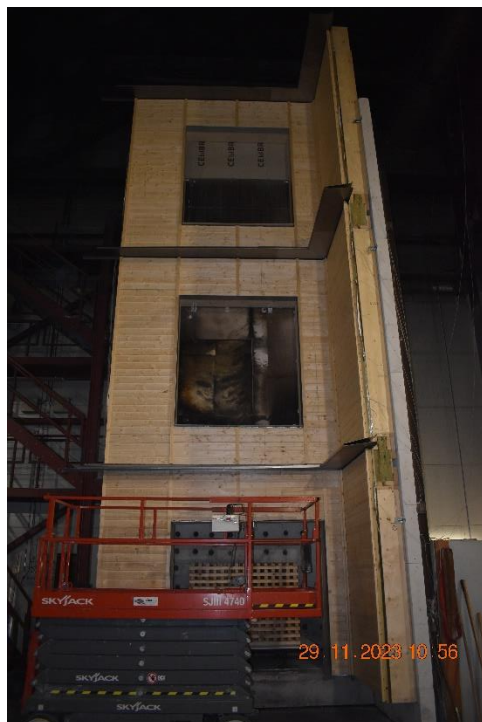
Frøslev 25 x 50 civil profiles have been mounted.
